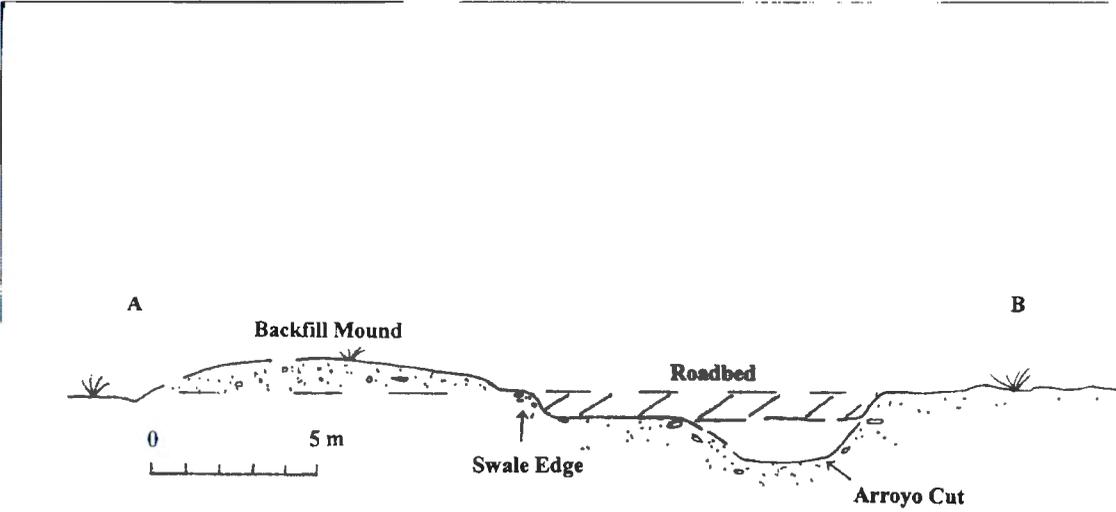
Cross Section, Chaco North Road Segment, LA 171063
